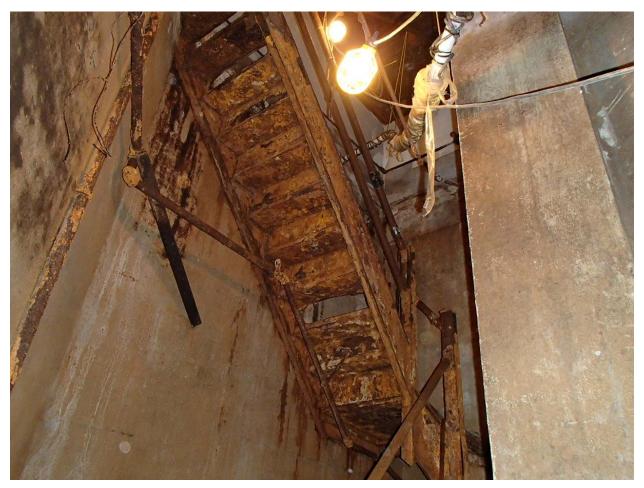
Stairs are very rusted with some risers rusted completely through. The condition of this utility stairs is indicative of the smaller steel members that in many cases have rusted through completely.
